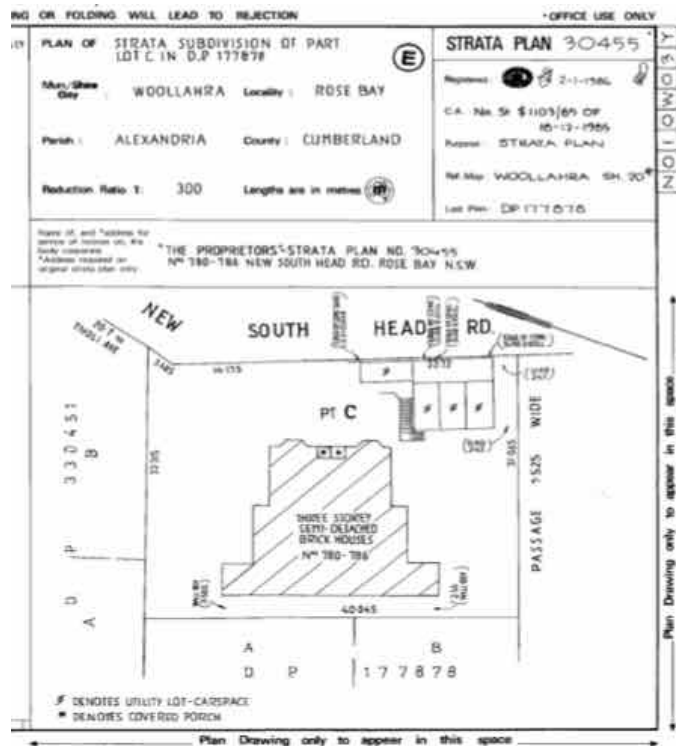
Current Hillcrest Site (Lot) Plan – S.P. 30455
